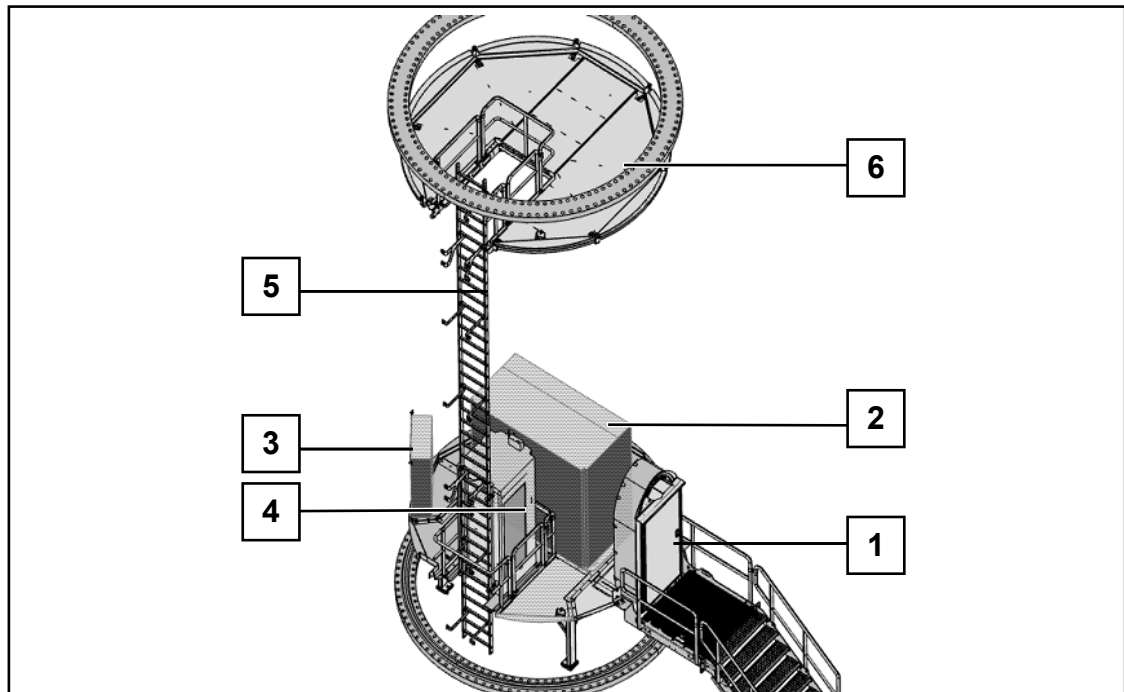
Overview of installations in the bottom section of the steel tube tower
